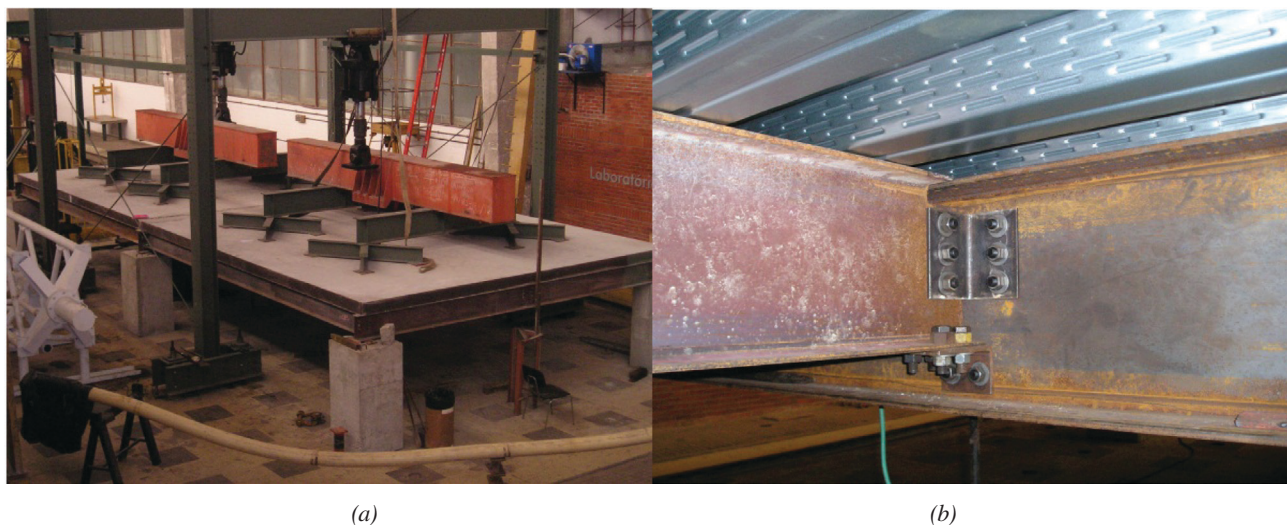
Full-scale testing of a semi-continuous floor system and one of the connections.
